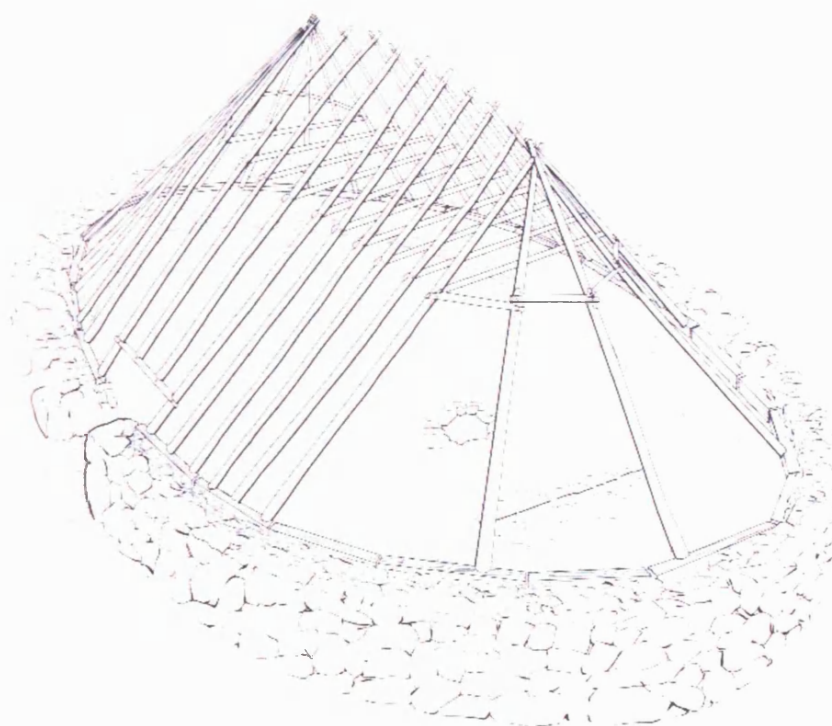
Conjectural reconstruction of House Z2 at Trethurgy Round (after Quinnell 2004: 195, Fig. 90).
